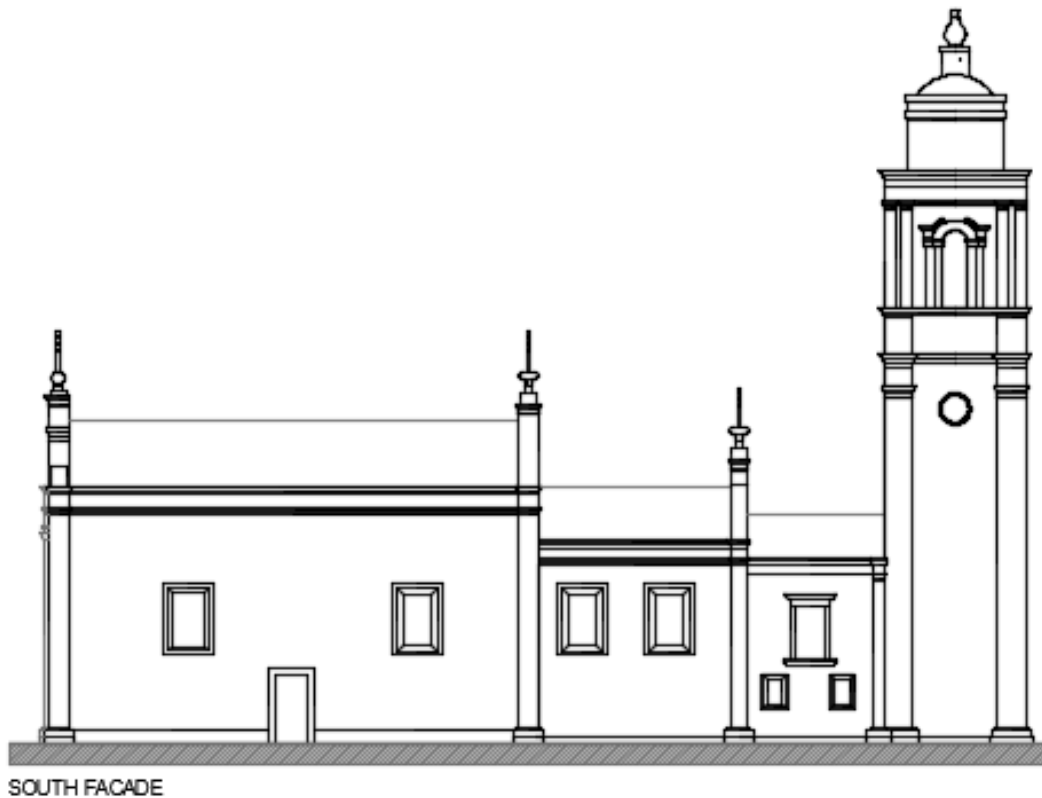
Elevation of the south facade (Betzer et al., 2014).
